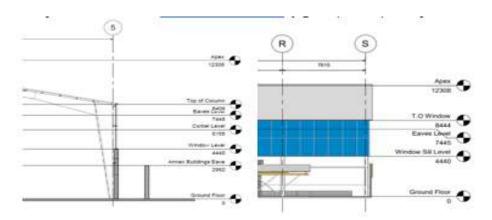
Building section and elevation extract indicating glazing height of 4m.
